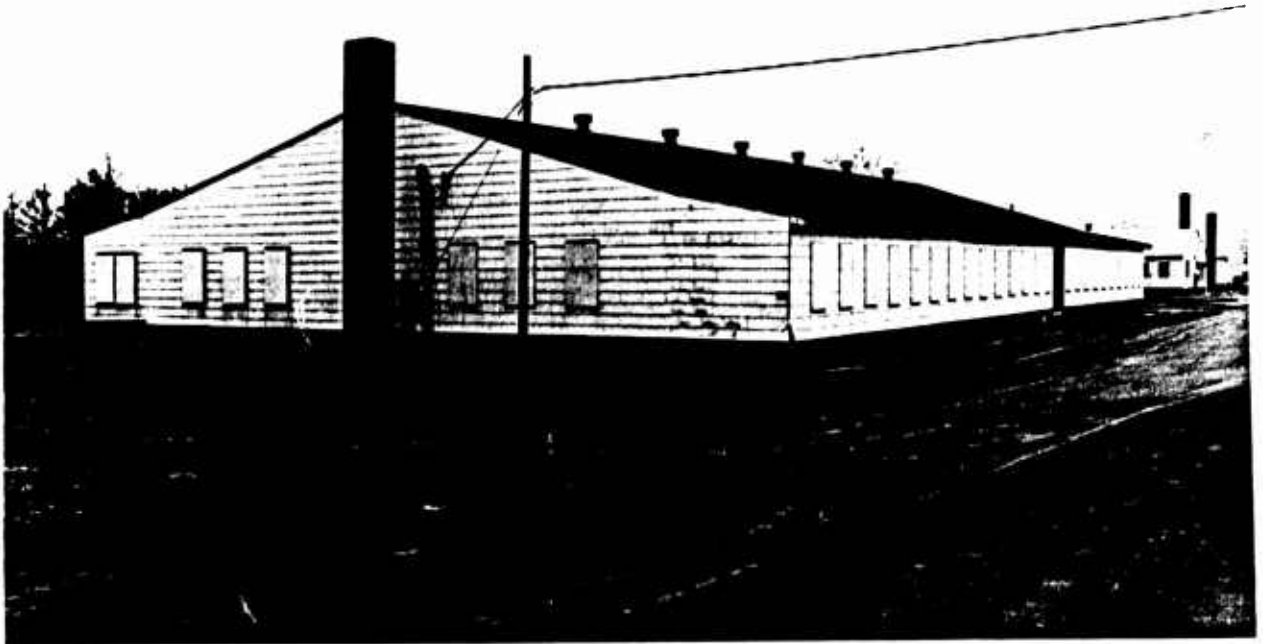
View of Building 277. This structure served as the clothing issue building for the 1301st Service Unit Reception Center. (Source: Field inventory photograph, 1984, Barbara Hightower, Building Technology, Inc.)
